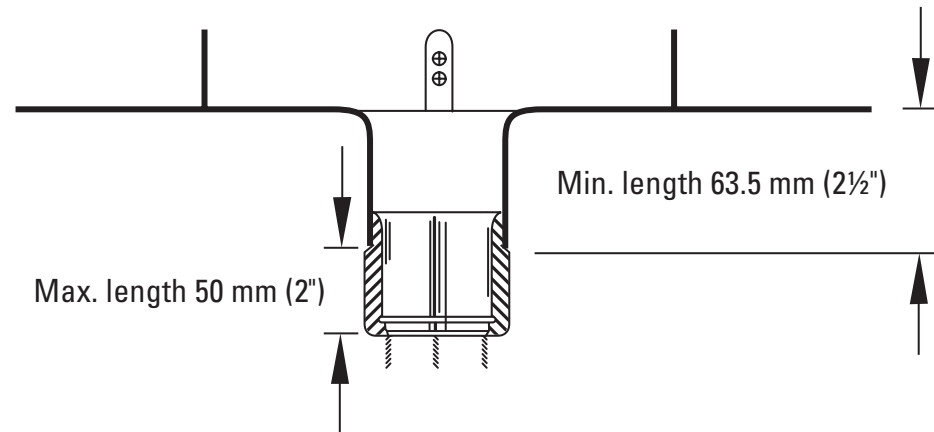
The minimum length of the metal retrofit drain stem with our Pro-Seal Assembly.
